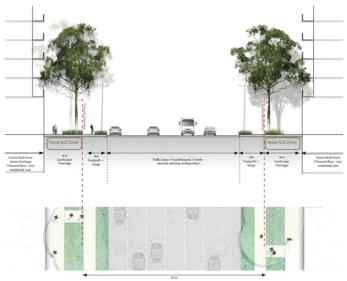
Indicative Section and Plan of Intermittent planting along the Princes Highway in the Amcliffe Precinc
